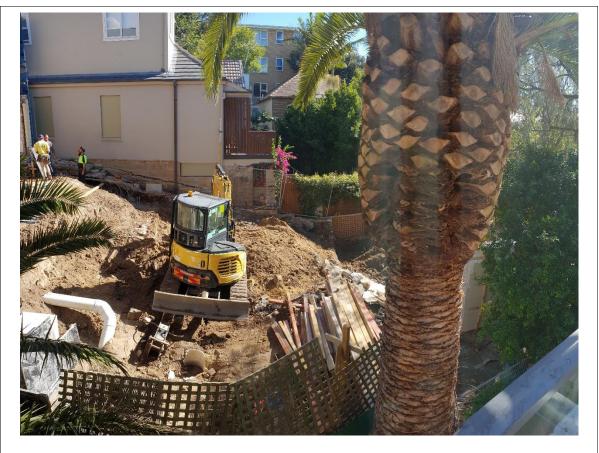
Site viewed from the first floor balcony of the adjoining site to the east, Unit 1/2-4 Miller Street.
